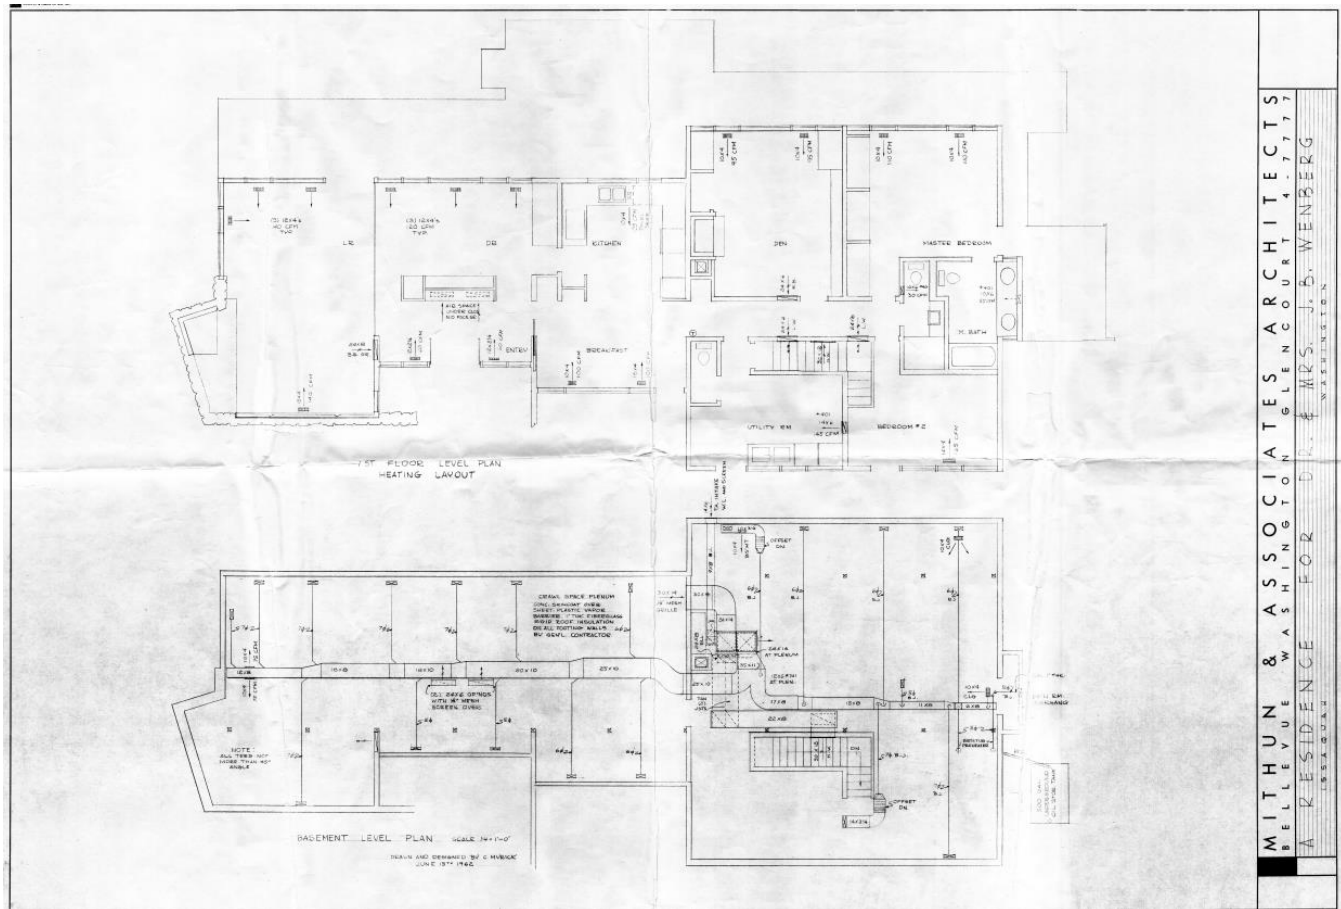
Mithun & Associates Architects, basement and first floor heating plans, drafted by C. Myrick, June 15, 1962. Source: Louise Bruse Wenberg Luce private collection.
